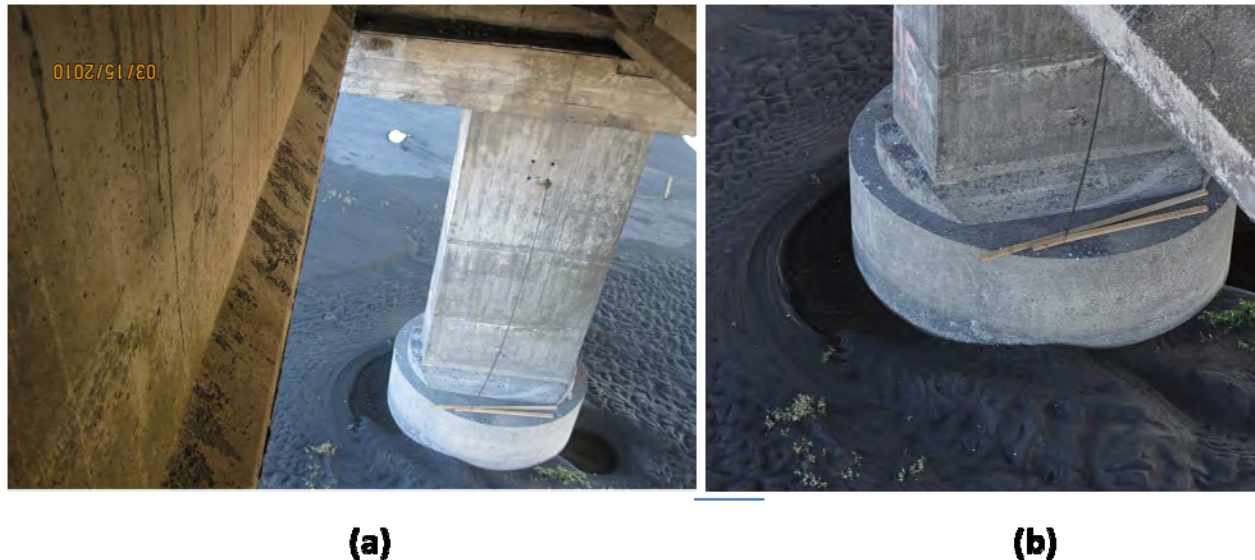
Juan Pablo II bridge—Evidence of liquefaction at piers subjected to settlements.(a)column and pier, (b) detail of pier and surrounding soil. (S36.826596° W73.094345° on 3/15/2010)
